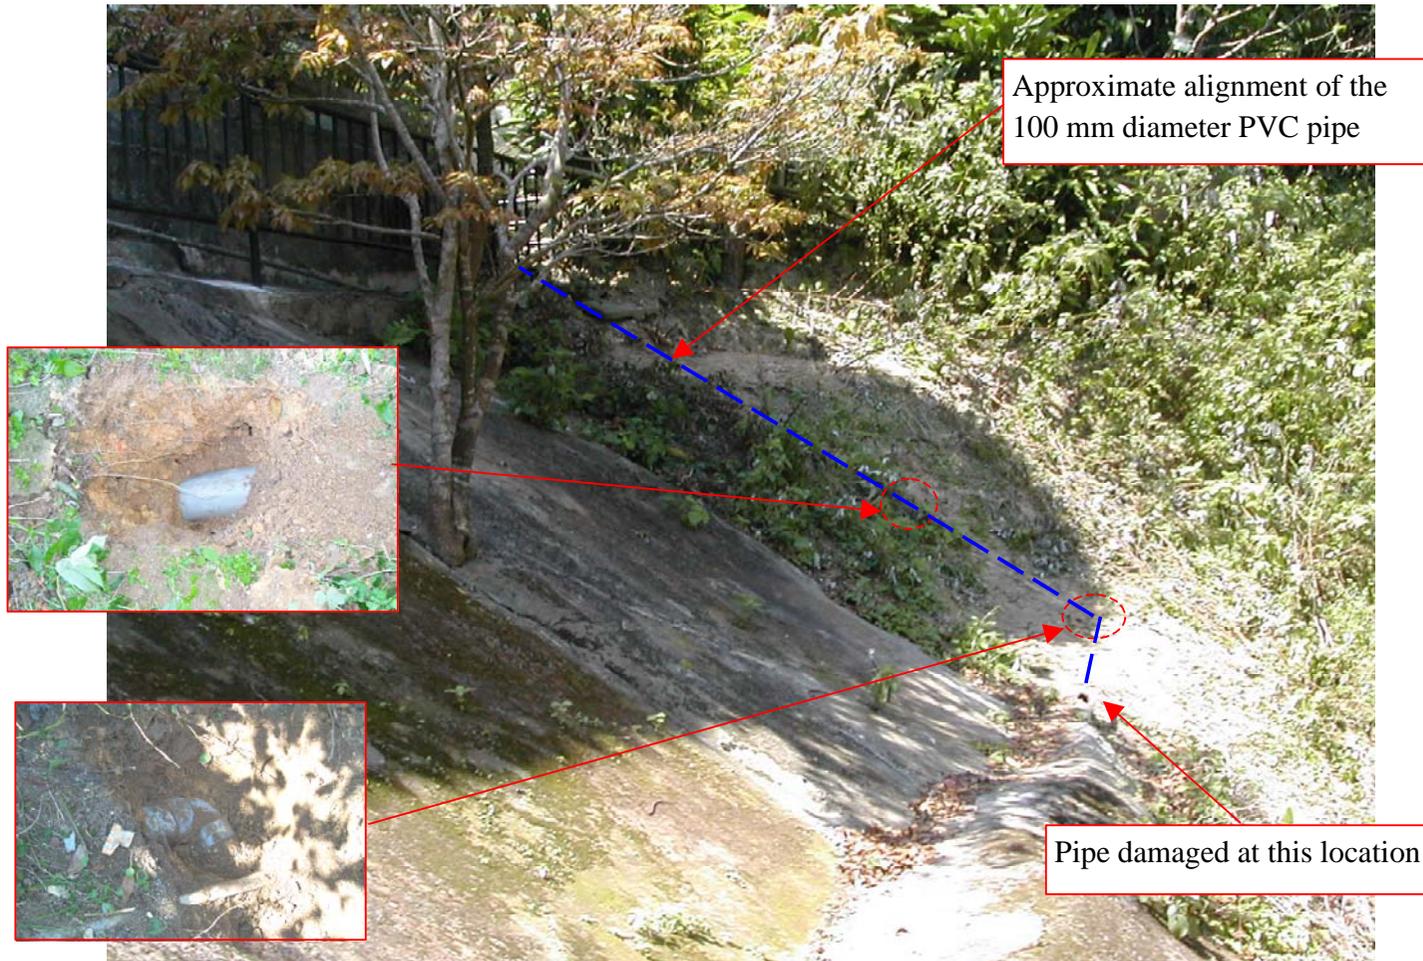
View Showing the Approximate Alignment of the 100 mm Diameter PVC Pipe on Slope No. 11NE-B/FR250
